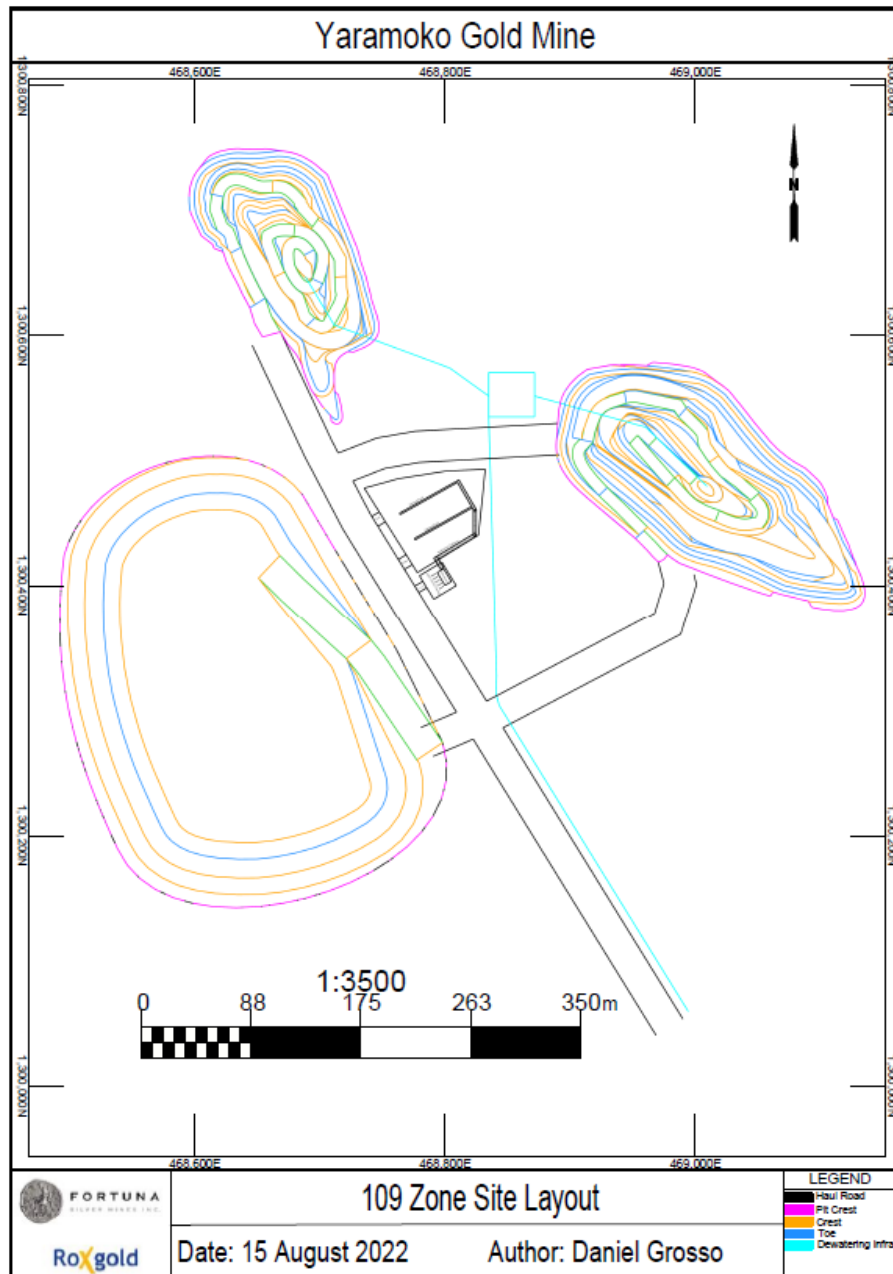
109 Zone open pit site layout showing dewatering infrastructure locations
